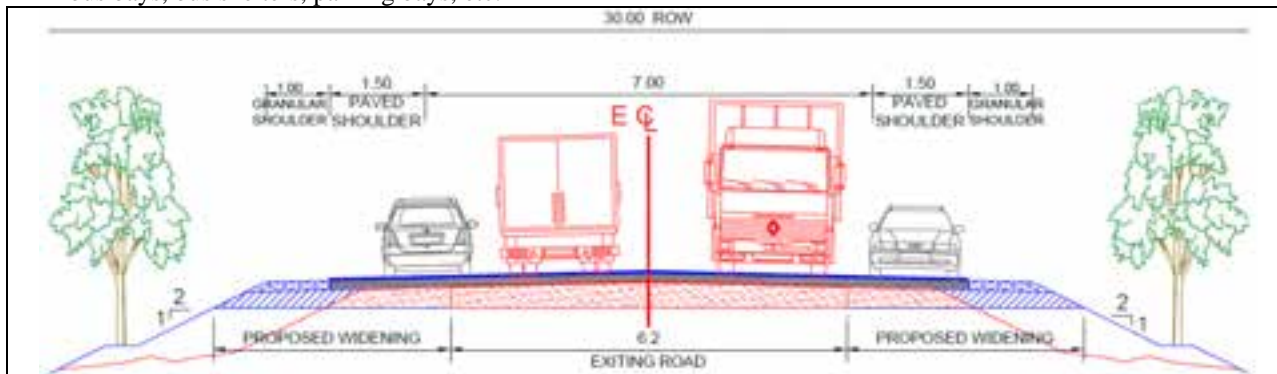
Typical Cross Section for 2 Lanes with Paved and Hard Shoulder (2L+PS+HS) Option
